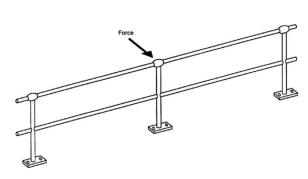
TYPICAL GUARDRAIL POST TEST
